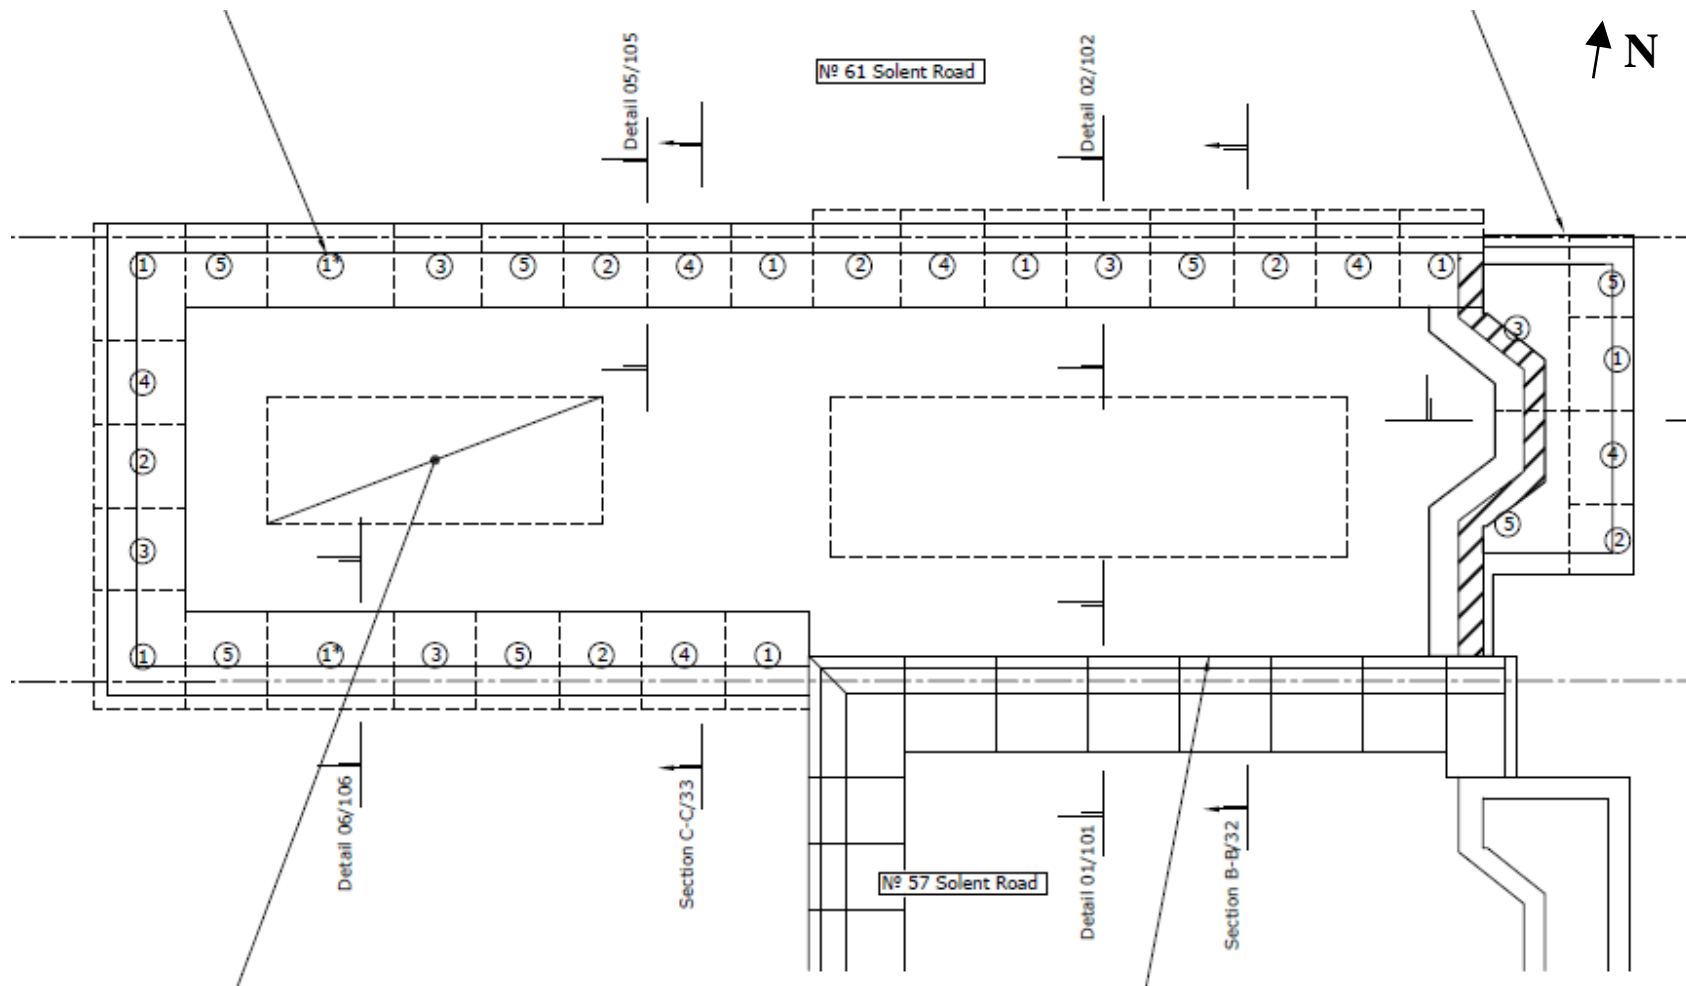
Layout of the proposed basement plan (Extract from Drawing 2298-11)
